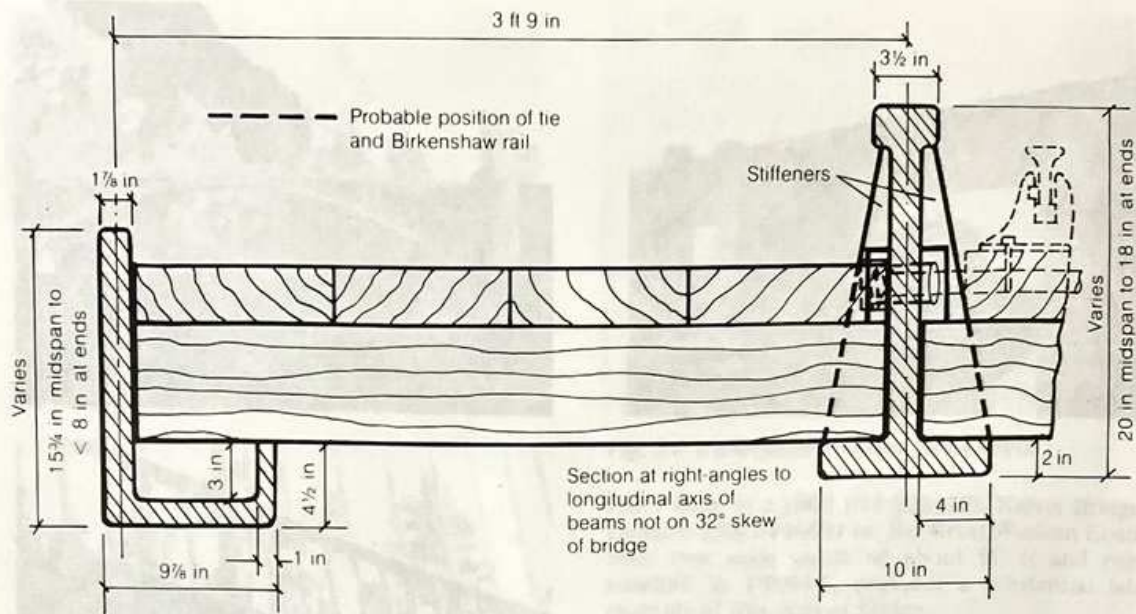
Braid Burn Bridge — cross-section from edge beam to first main beam
